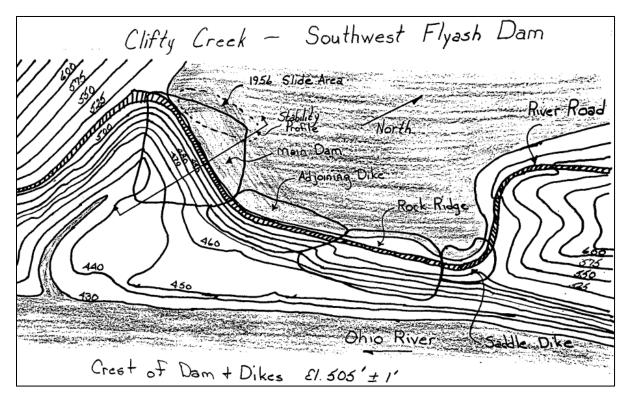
LRCP Dam Construction Detail (AEPSC, 1985)
